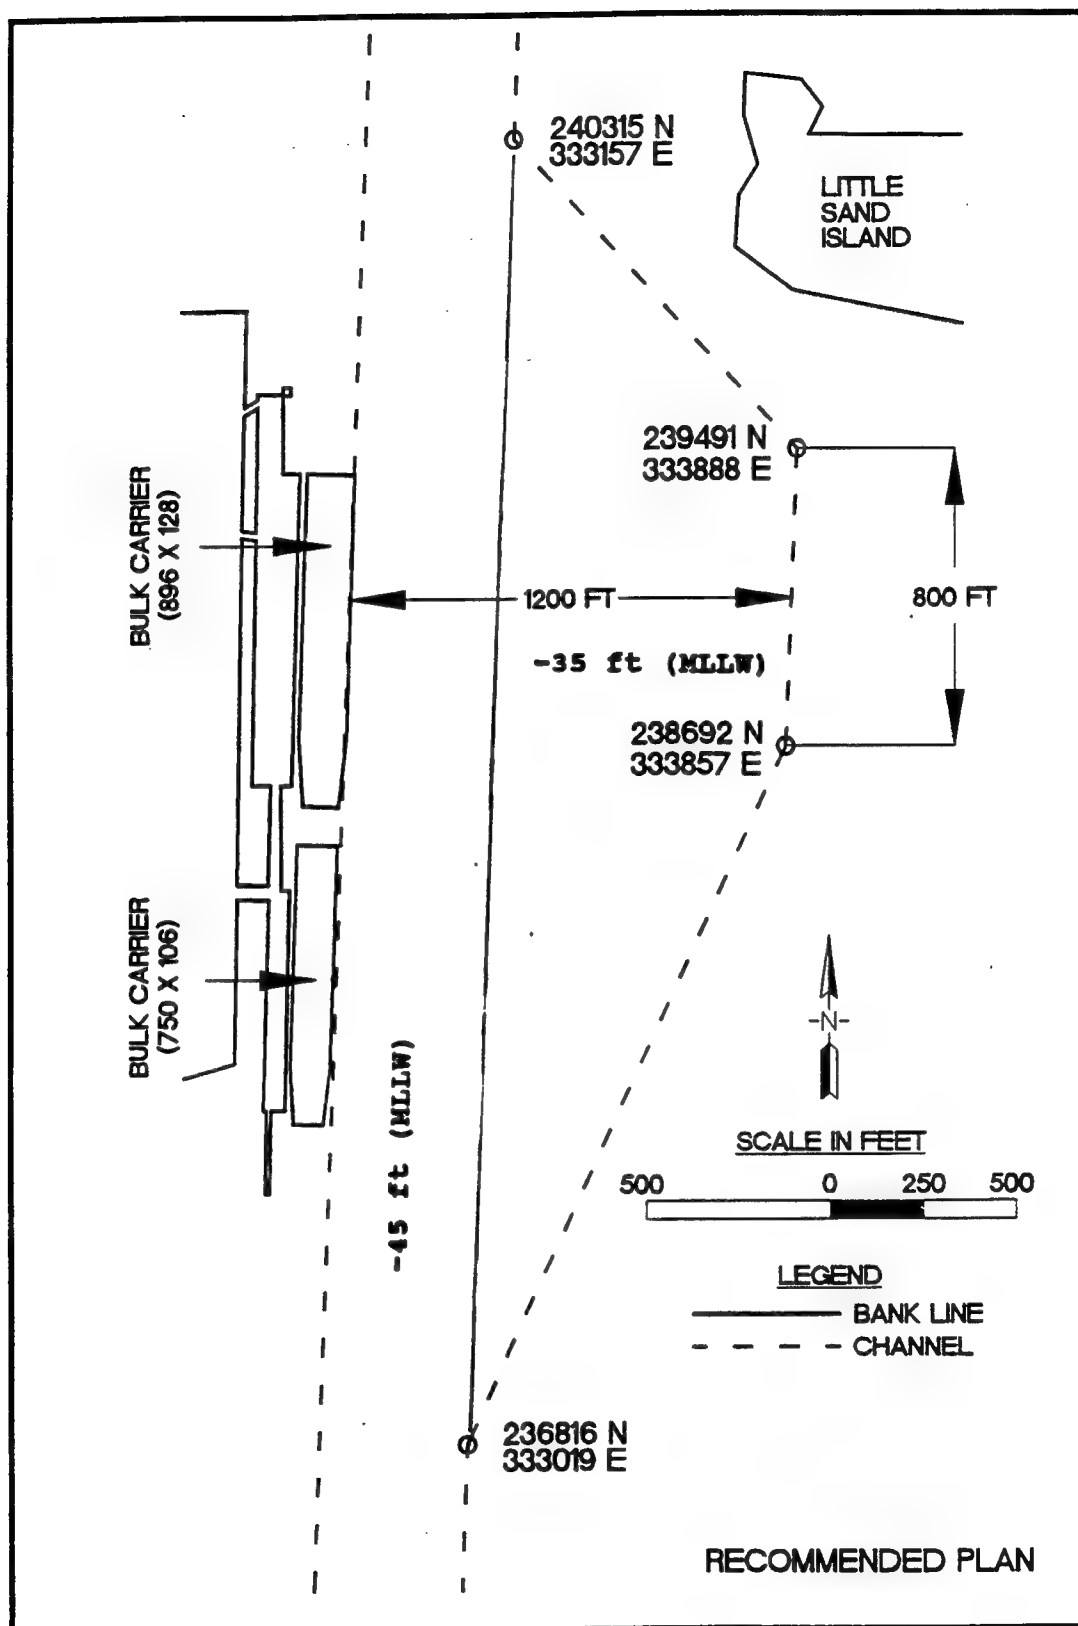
Recommended plan (original) (for Bulk Carrier 950' x 145' x 33')
